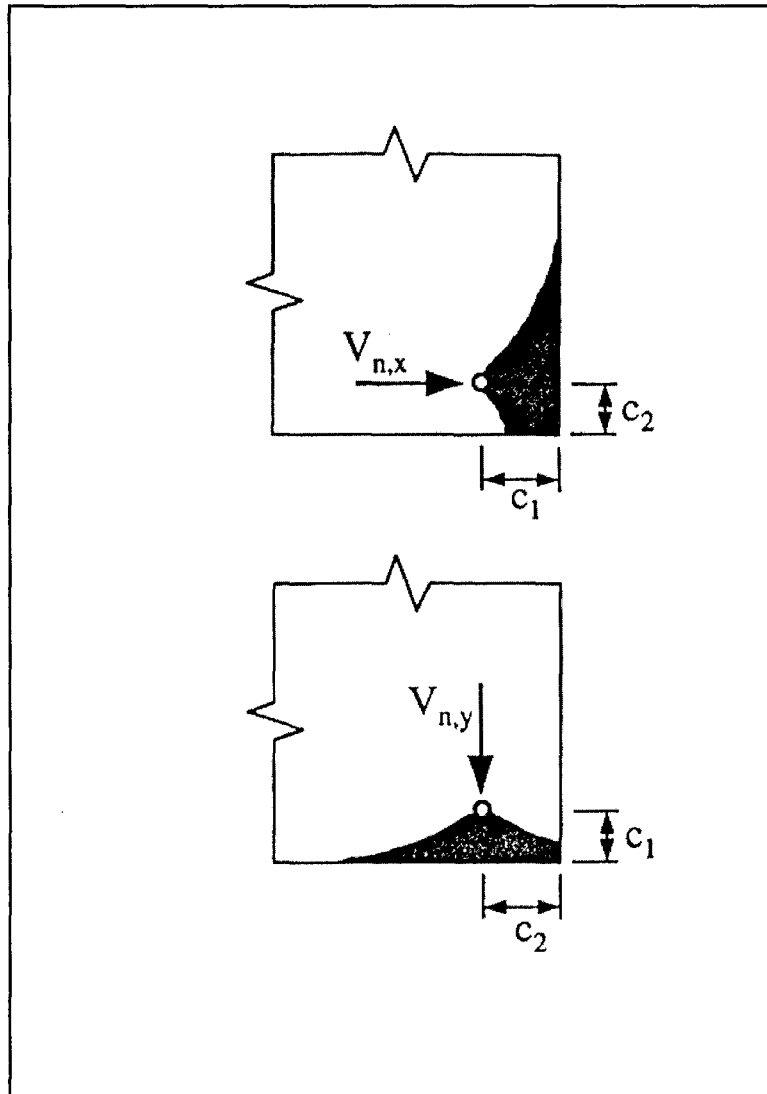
Anchors near a corner.
